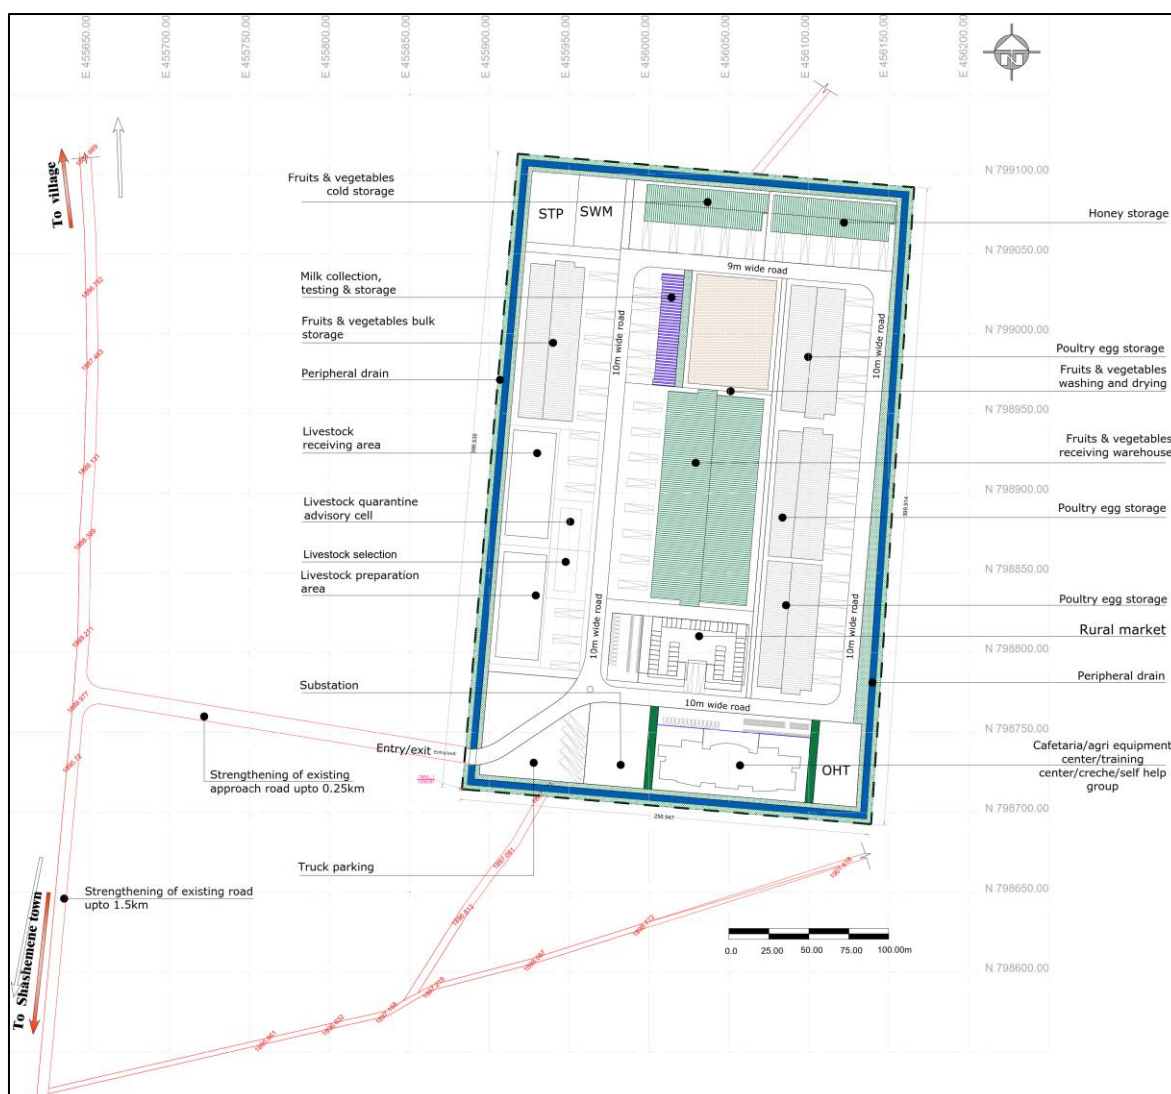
Master Plan of the Shashemene RTC (adapted from MACE master plan drawing)
